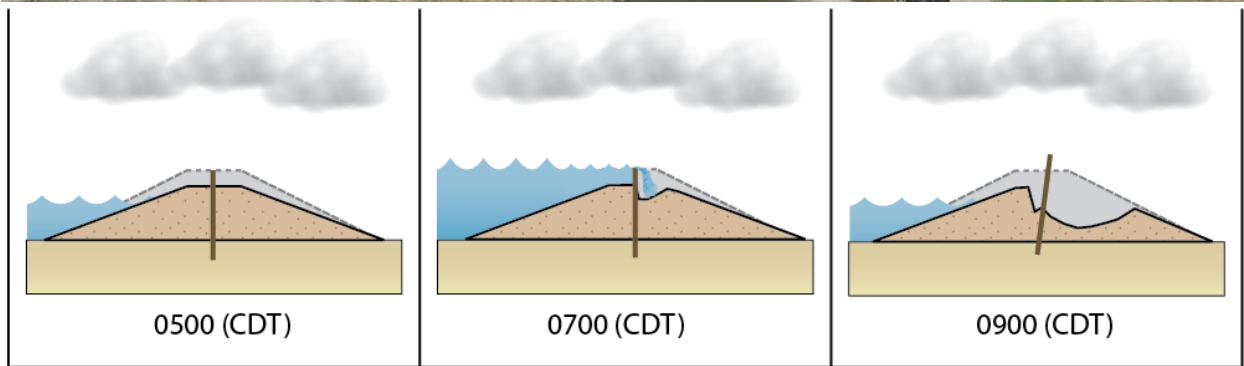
Location C – Sheet pile overtopping erosion and breaching.
